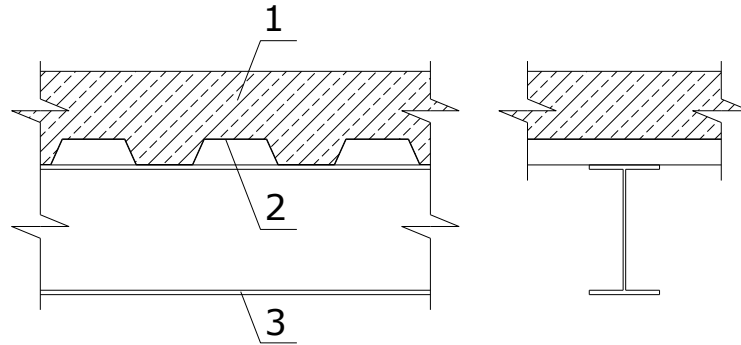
Steel-concrete composite floor (1-RC slab, 2-trapezoidal steel sheet, 3-steel beam)
